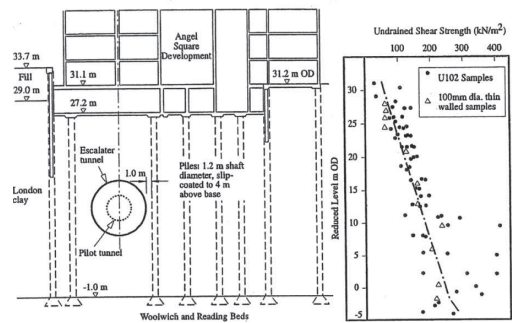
Cross-sectional view of Angel underground station case study (after Lee et al., 1994).
